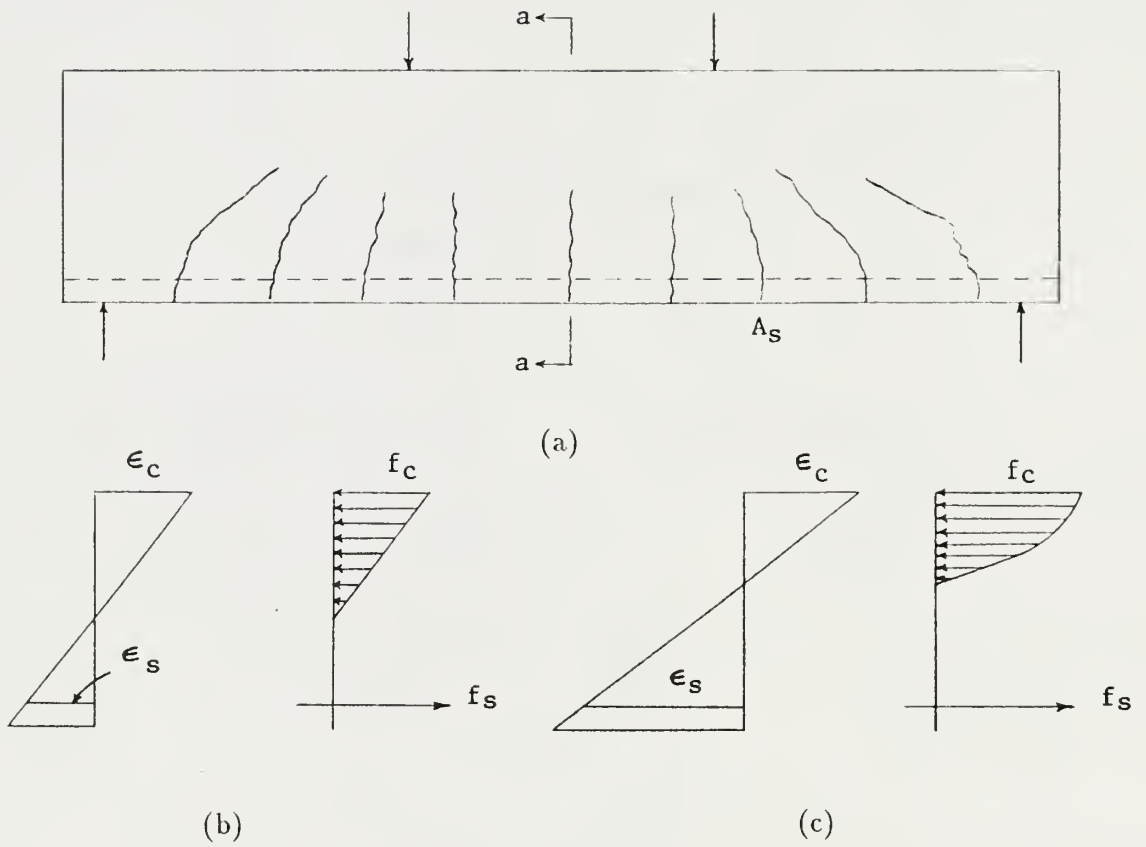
Behaviour of Reinforced Concrete Beam under Increasing Load.
